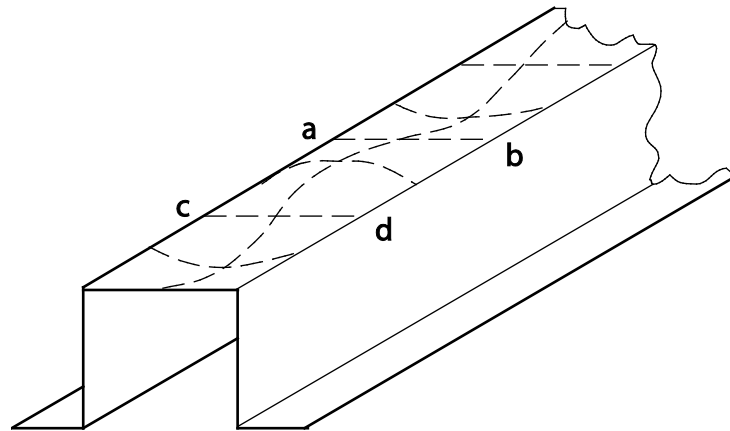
Local Buckling of Stiffened Compression Flange of Hat-Shaped Beam
